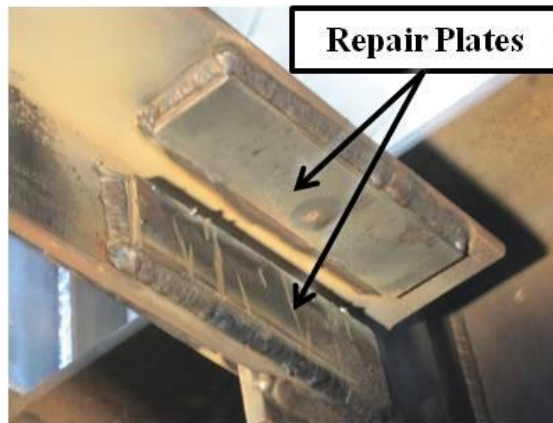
K Frame Fatigue Crack Repair in Strut (KF_2)
